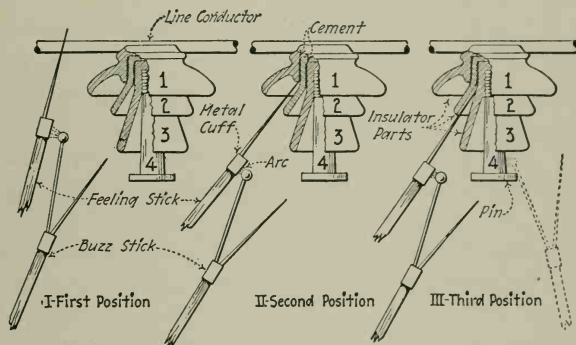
Diagram showing the progressive positions of the first step or feeling-out process of the Buzz-Stick method of locating a defective part of a pin-type multiple-part insulator. (T. F. Johnson, Jr., Atlanta, Ga.)
